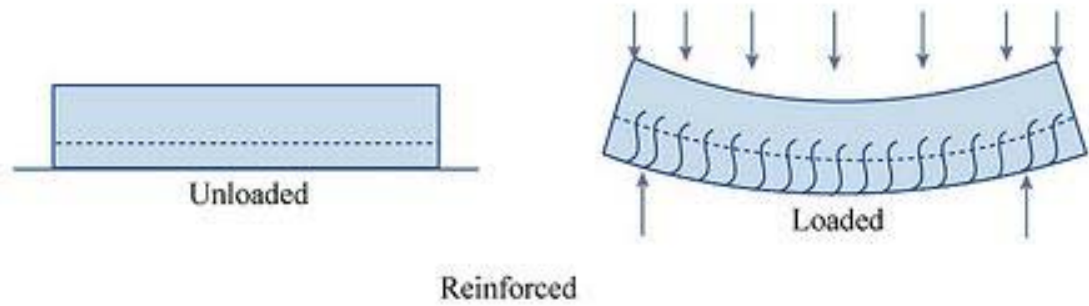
Typical reinforced concrete beam schematic (MIT OpenCourseWare, 2008)
